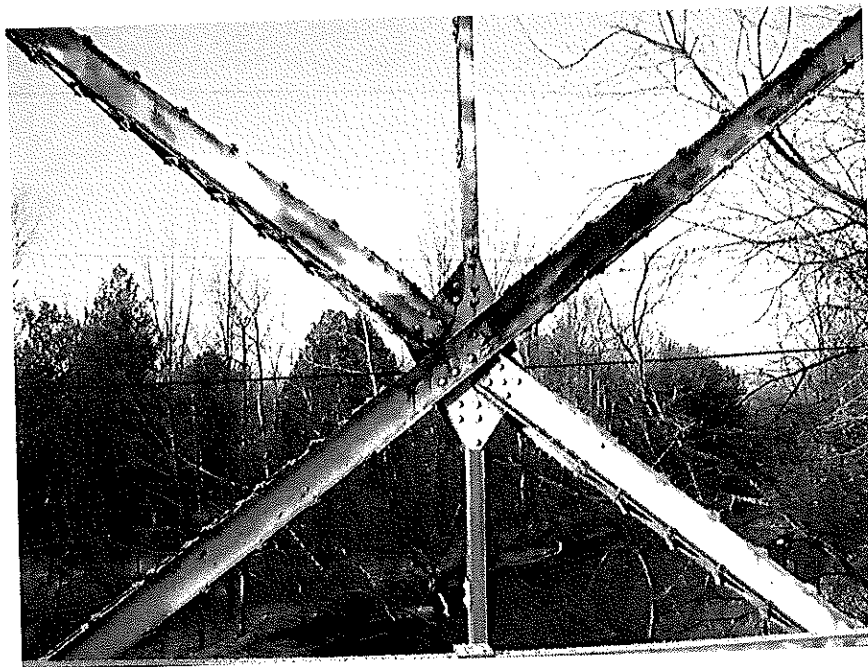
View to the West from the Midpoint Centreline of the Collingwood Street Bridge Showing Superstructure Detail and Corrosion
